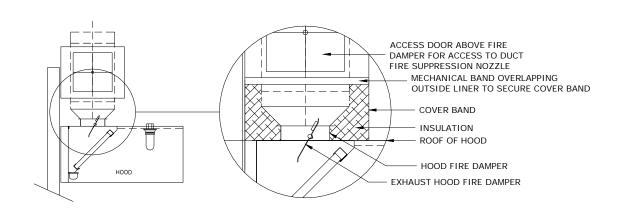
FD Hood with exhaust fire damper showing access door above starter piece
